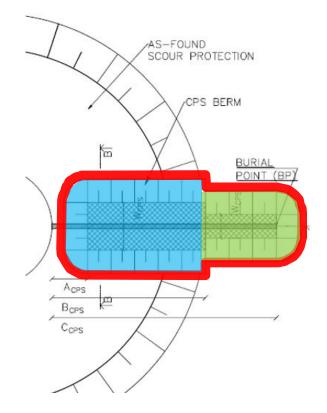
Depiction of new rock placement for on and off scour pad areas at WTG foundations
